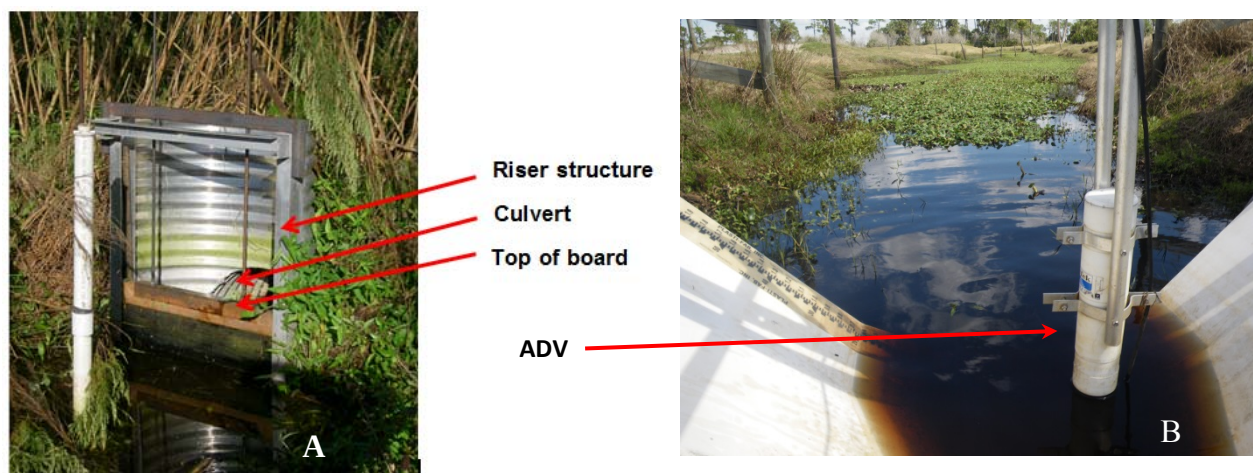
A) Ranchland water retention BMP (flashboard riser with boards) installed at site 2. B) Flume with Acoustic Doppler Velocimeter (ADV) installed.
